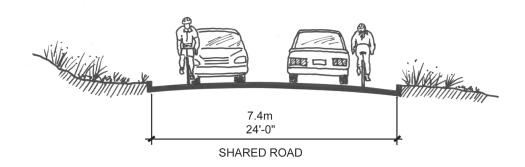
Existing Condition of Juan Bautista de Anza Trail at Battery Caulfield Road
